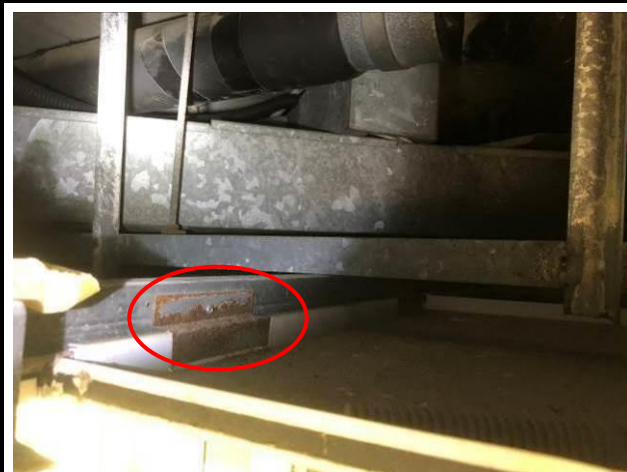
| Bracket connecting grid and ceiling panel was rusty.
